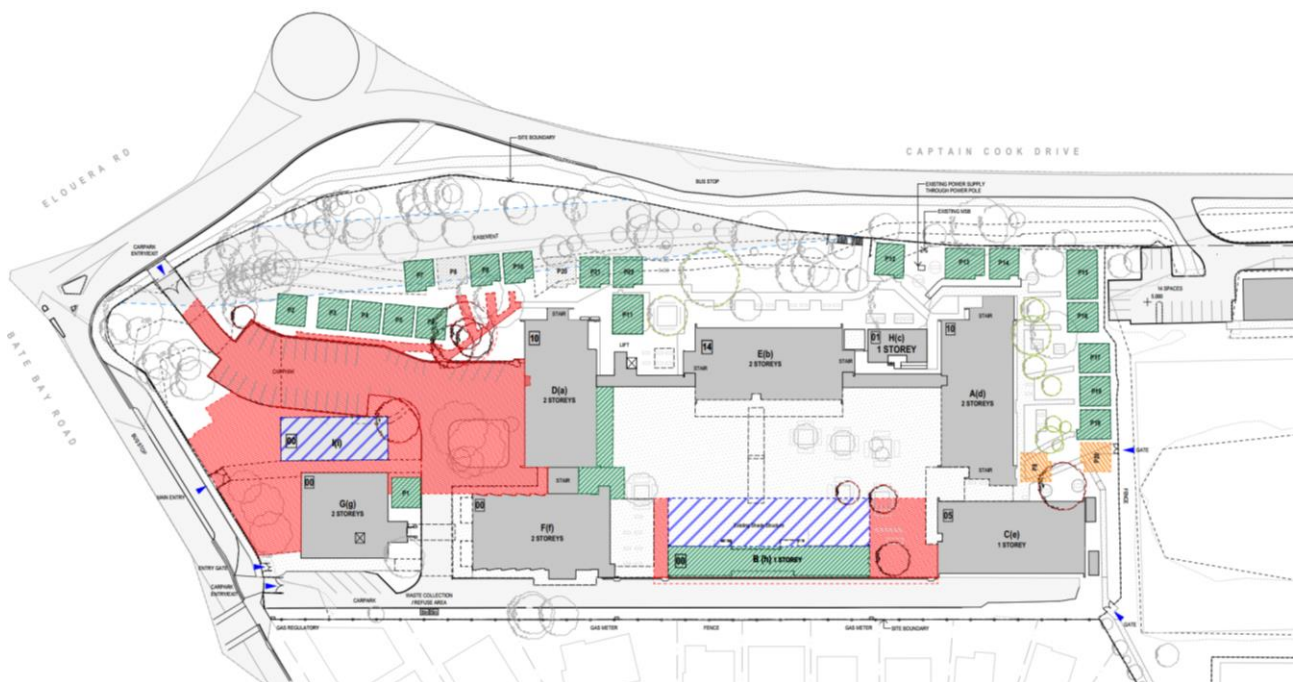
Demolition plan, showing trees to be removed (Source: Fulton Trotter Architects)
